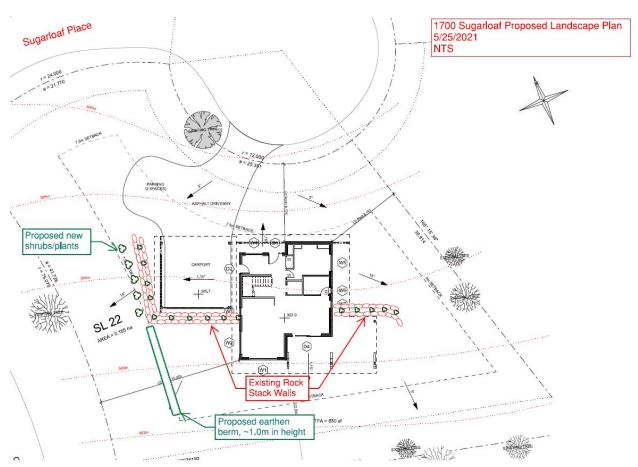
Landscape Plan Completed by BC Passive House Inc.
